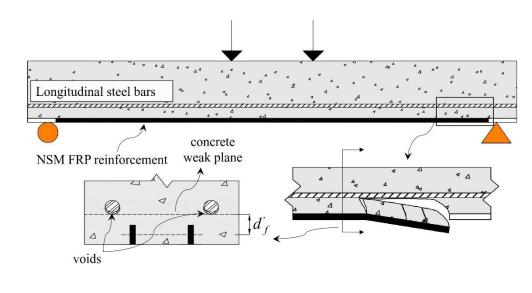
Concrete cover separation of RC beams strengthened with NSM FRP reinforcement
